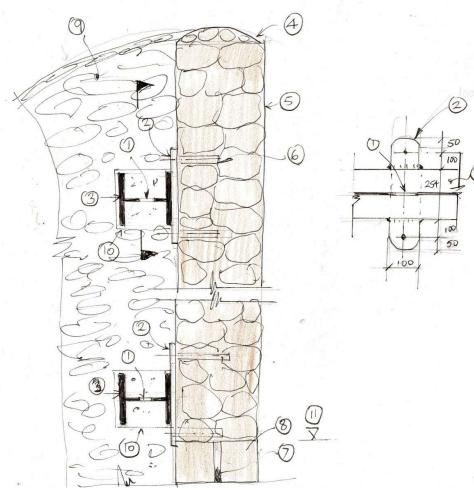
/SK C3 New flood relief wall cladding and capping
